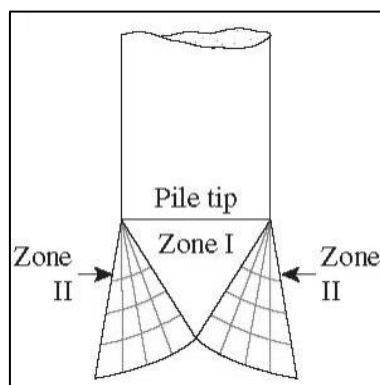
Failure surface developed for single pile (DAS 7th edition)
